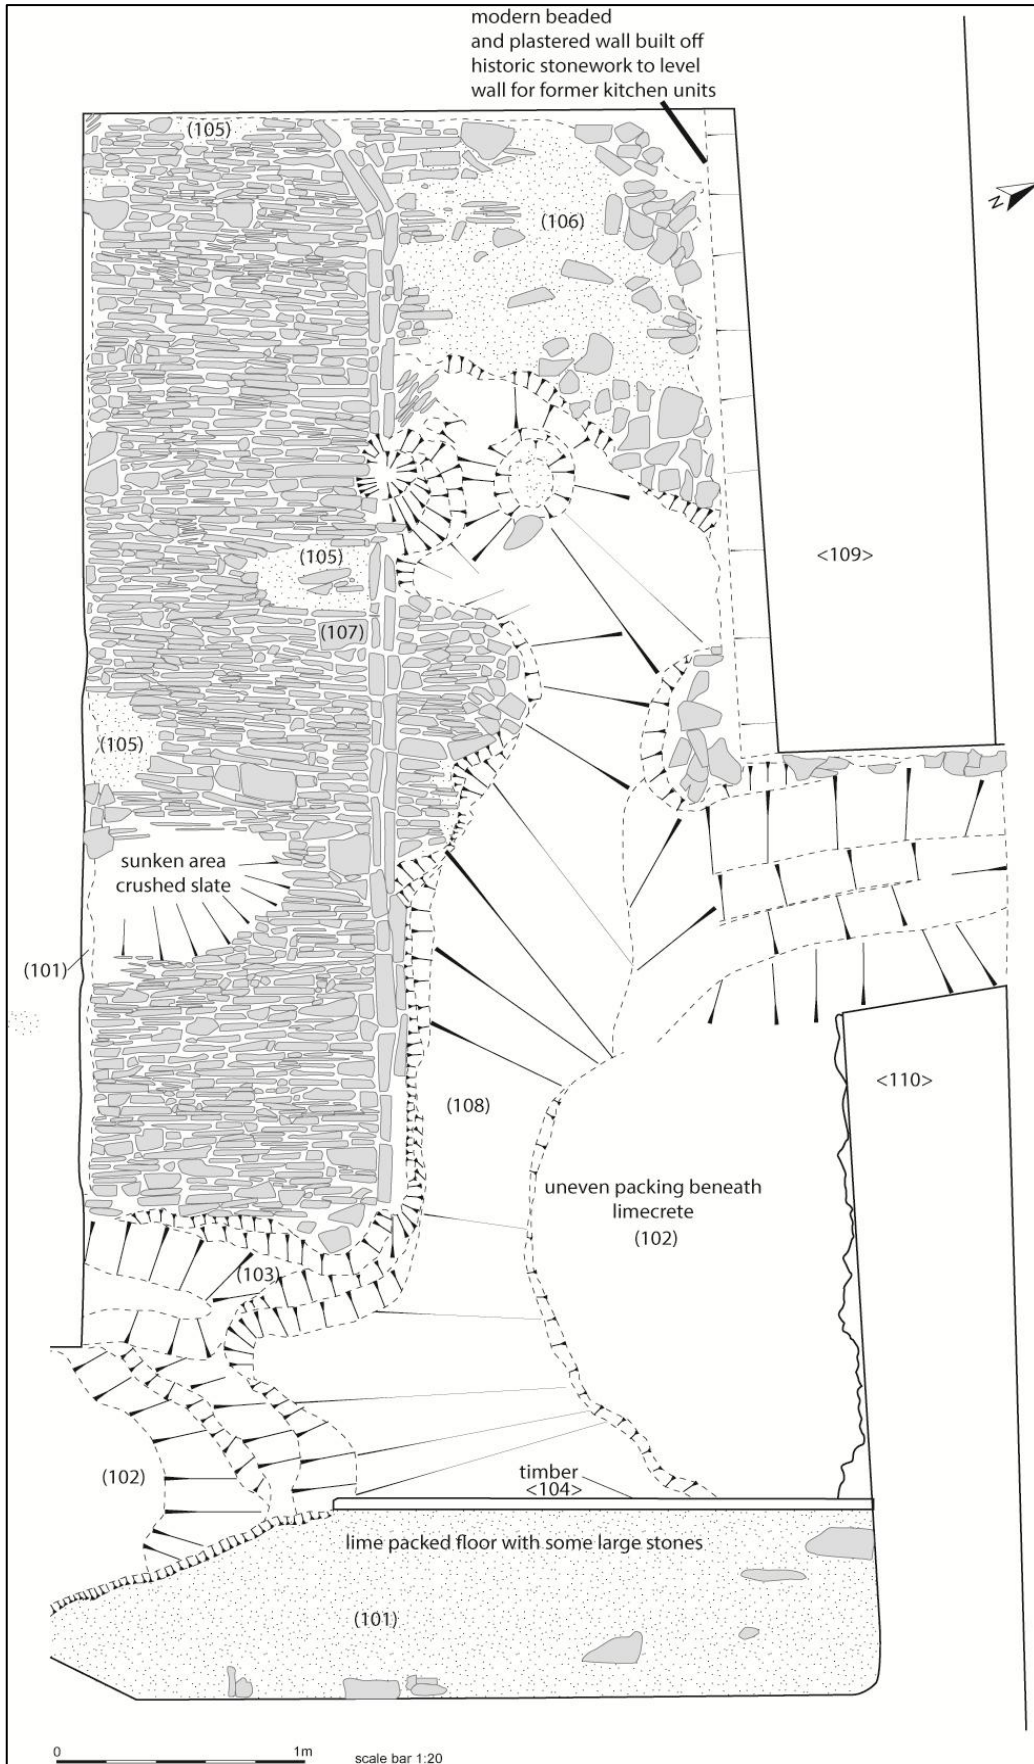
SCALED PLAN OF COBBLED FLOOR (107).
